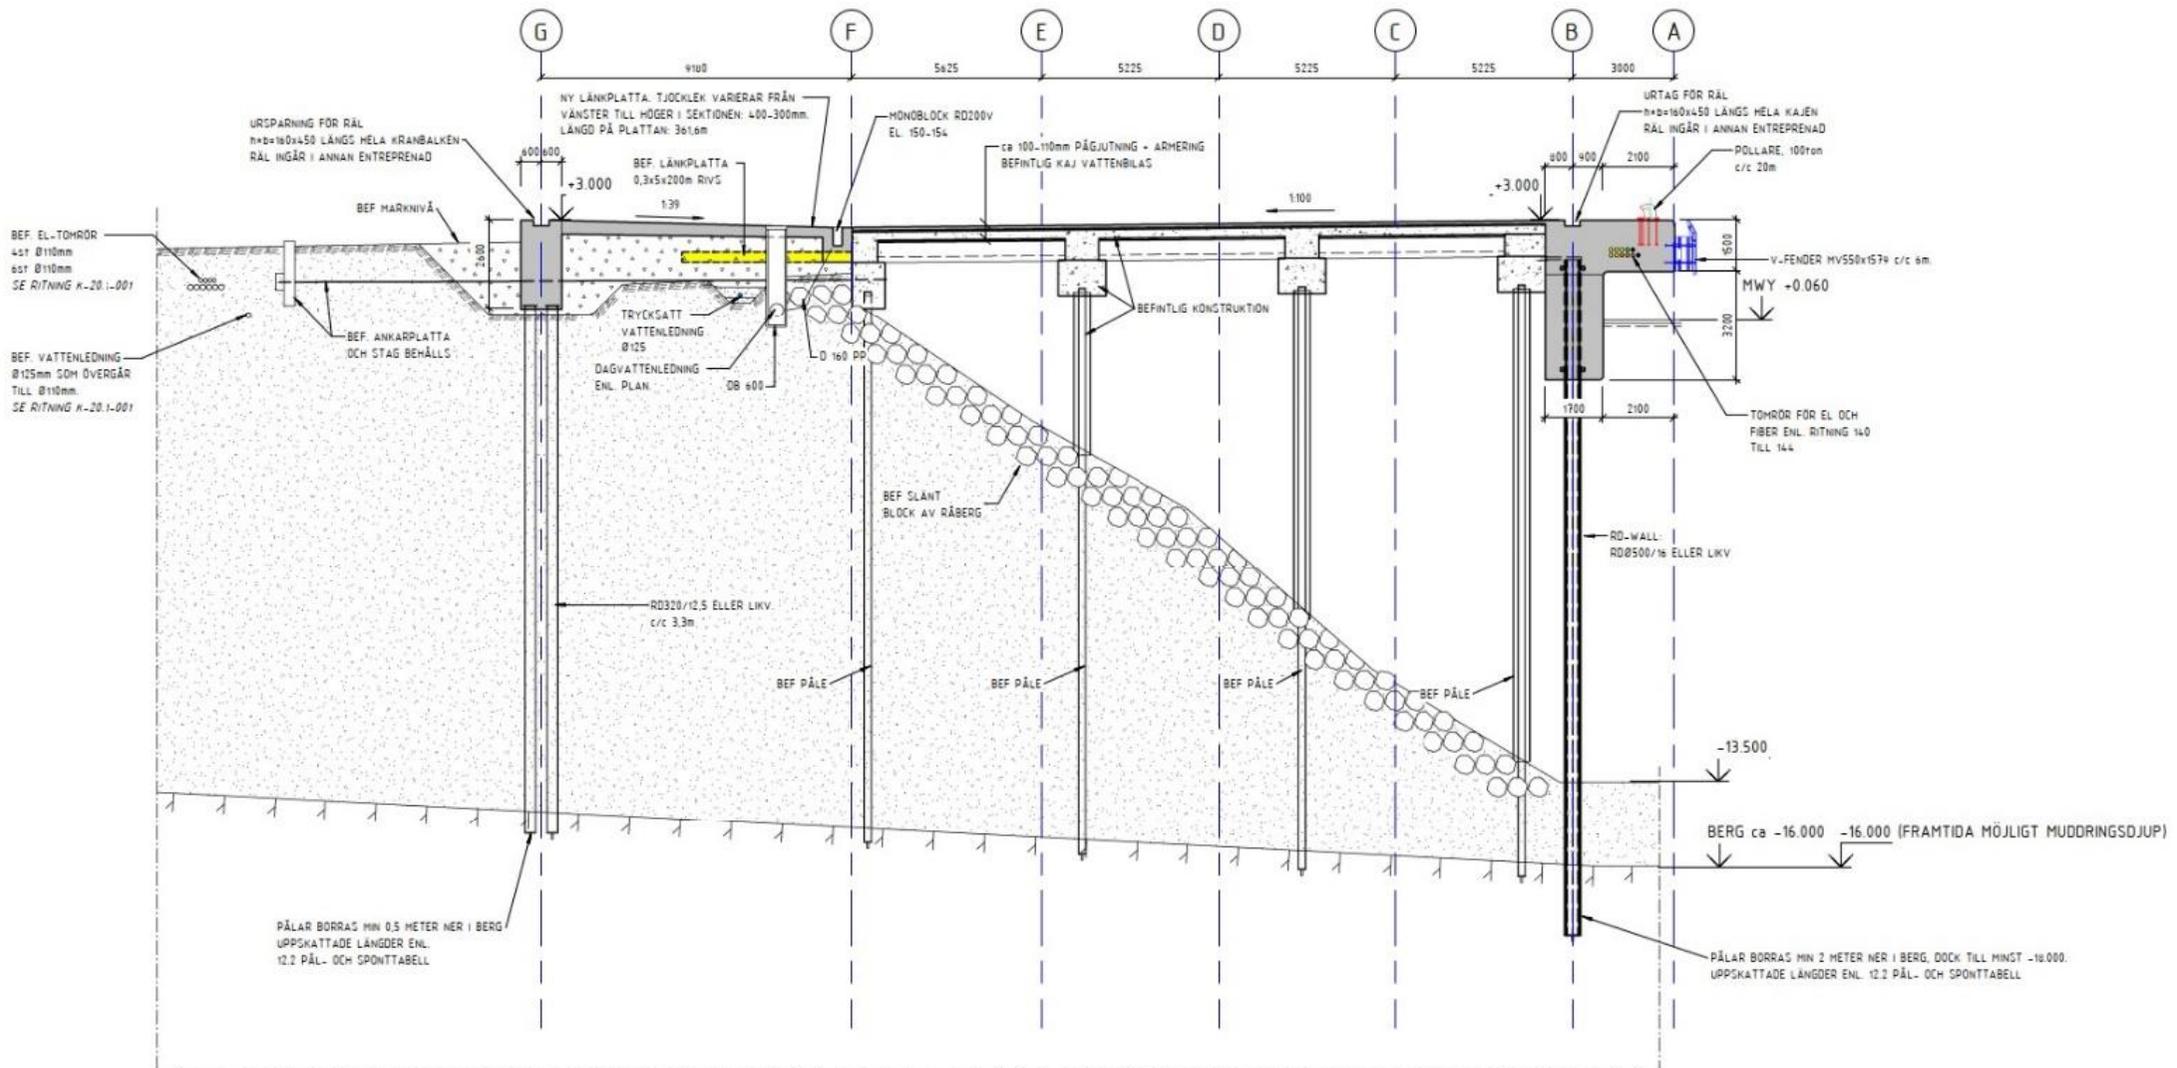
Reinforced concrete slab between the quay and the foundation for the container cranes on land
